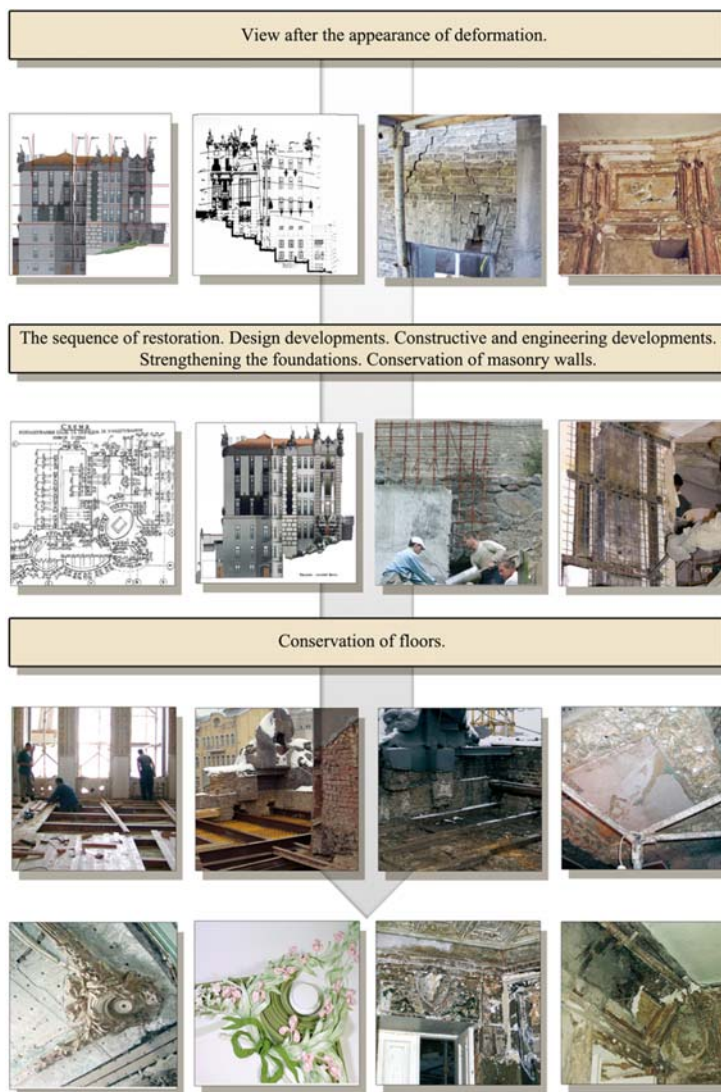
The problems and restoration methods of the building of architect W. Horodecki at 10 Bankova Street in Kyiv
